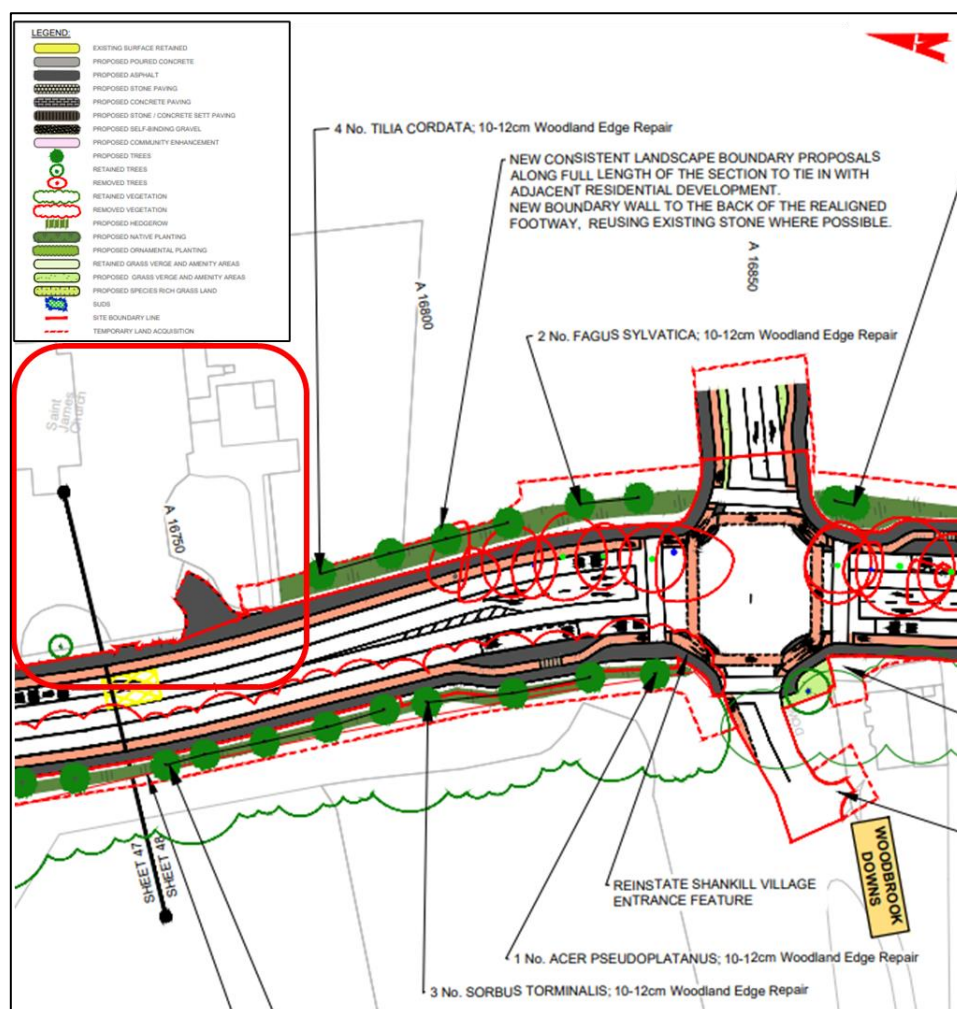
Extract from Landscaping General Arrangement Drawings – (Sheets 48)
